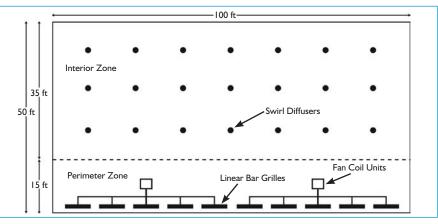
Floor plan for design tool example showing diffusers and underfloor fan coil units.
